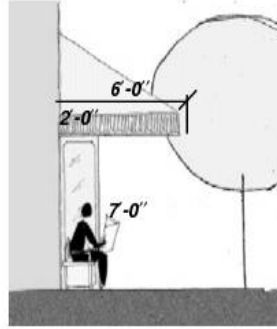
(E): Examples of encroachments into the sidewalk.
